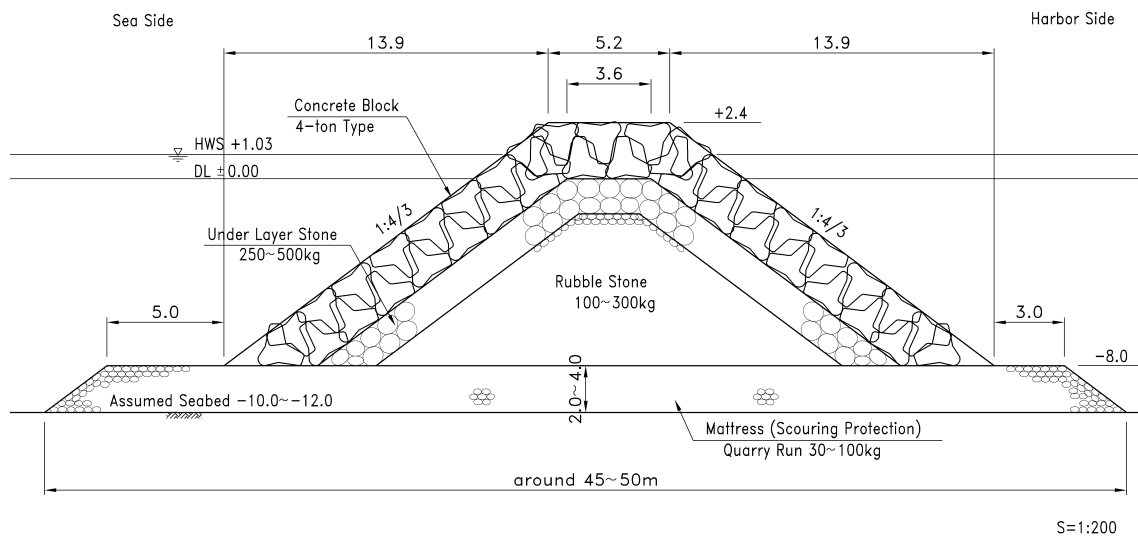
C-3 Typical Section of Bojonegara Breakwater
